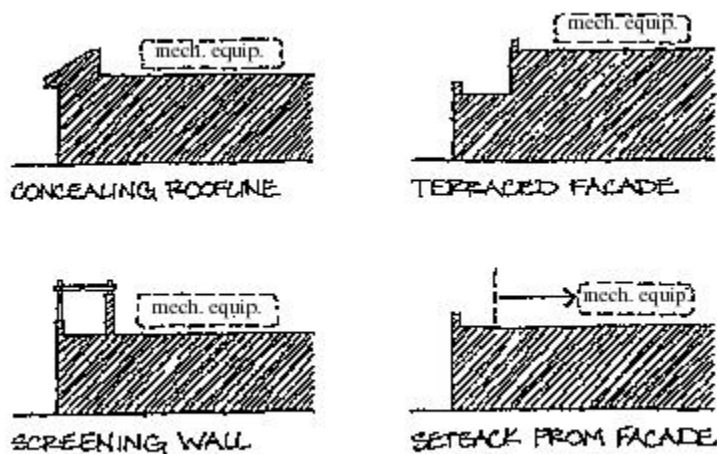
G – Rooftop equipment shall be screened from street level view through on the methods shown.
